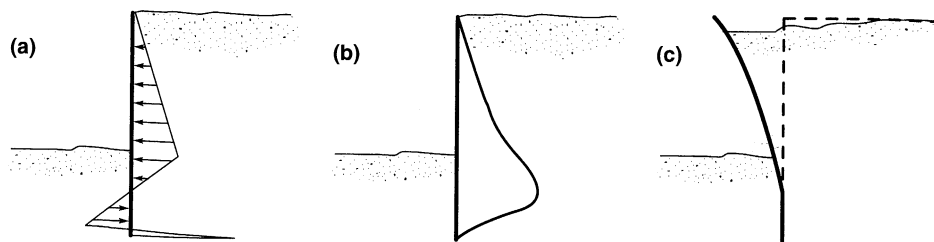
(a) Soil pressures, (b) bending moments, and (c) flexural failure mechanism for cantilever retaining wall.
